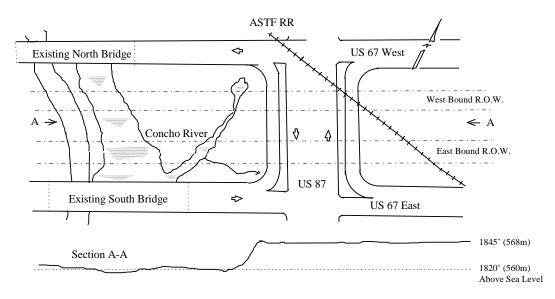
Concho River Site Plan with Proposed Bridge Right of Way
